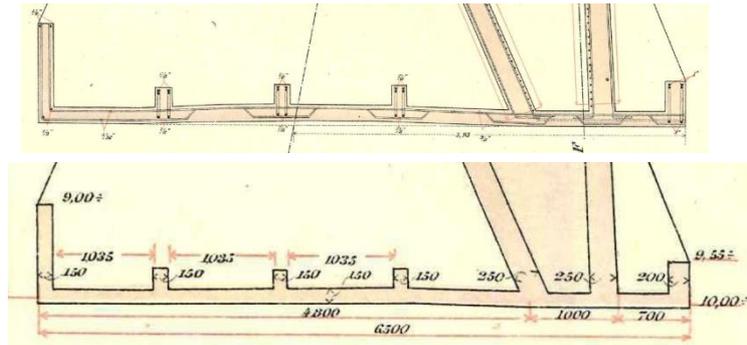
Detailed view of the reinforced concrete baseplate (original drawing) above: reinforcement layout, below: cross-sectional dimensions
